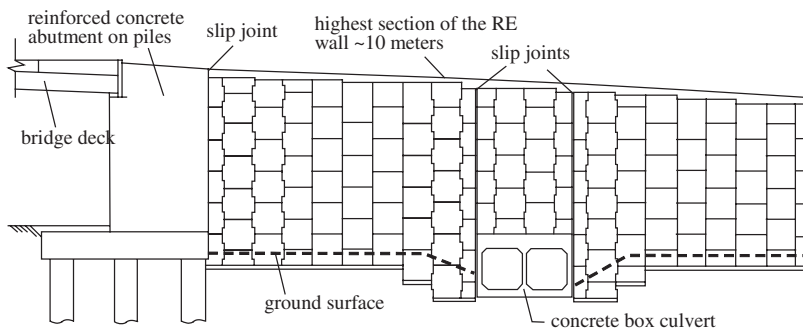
Side view of the Arifiye Overpass RE wall (northern approach embankment).
